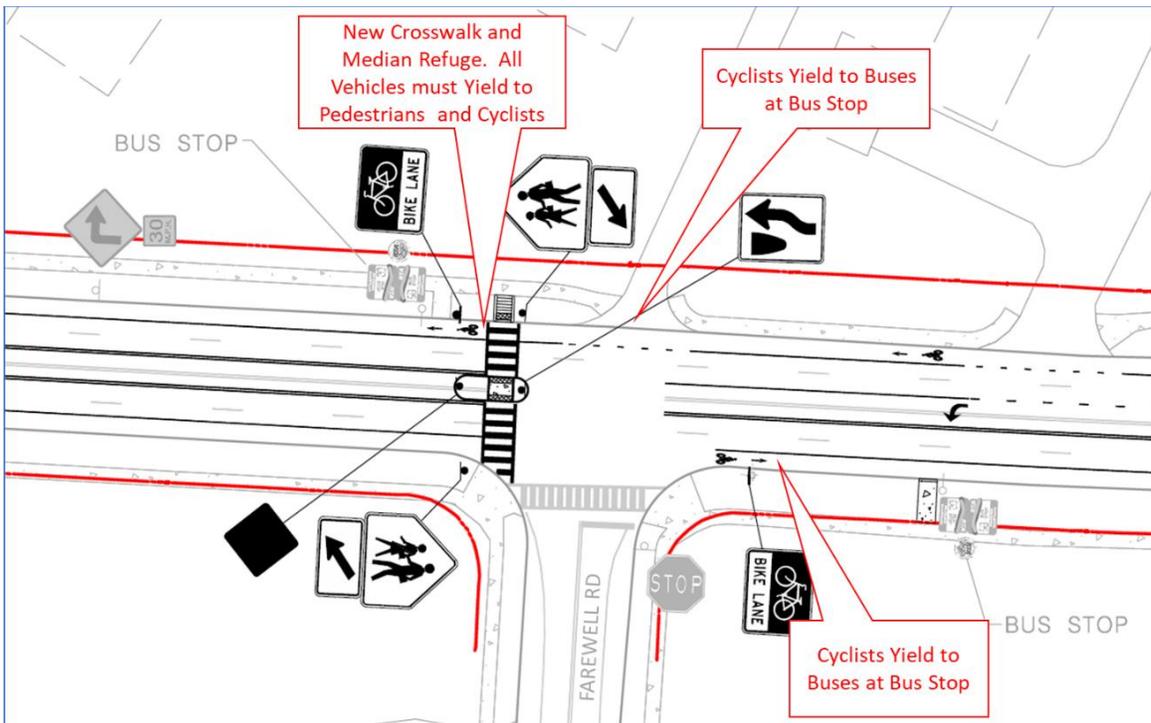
New crossing proposed at Oakland Mills Road at Farewell Road
